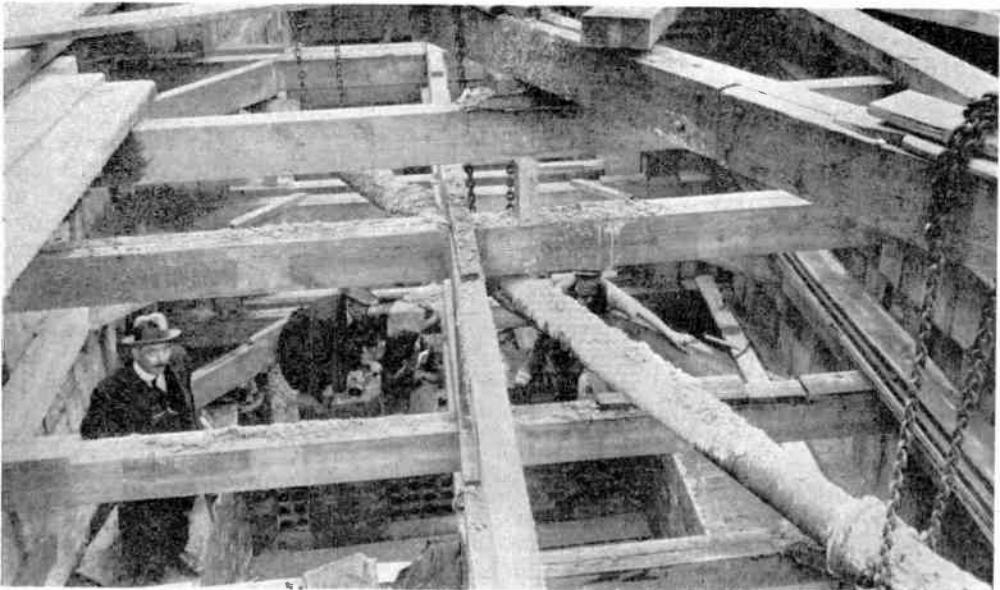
LARGE MANHOLE UNDER CONSTRUCTION.
